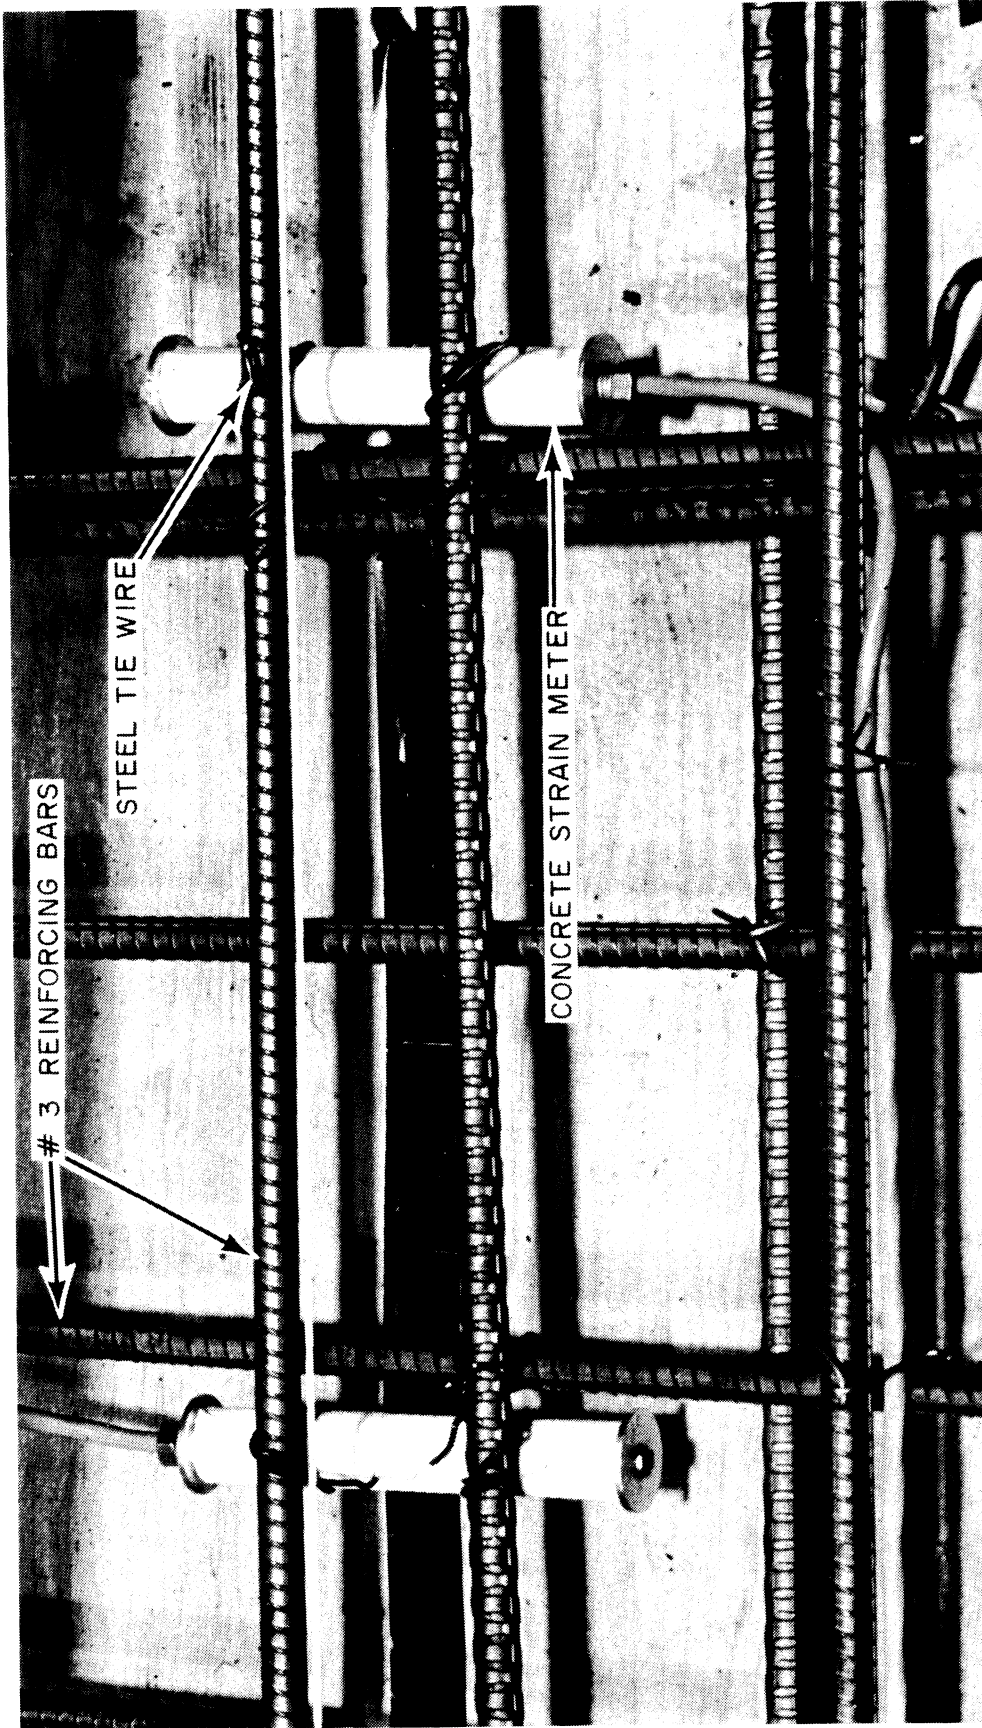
TYPICAL INSTALLATION OF A CONCRETE STRAIN METER
